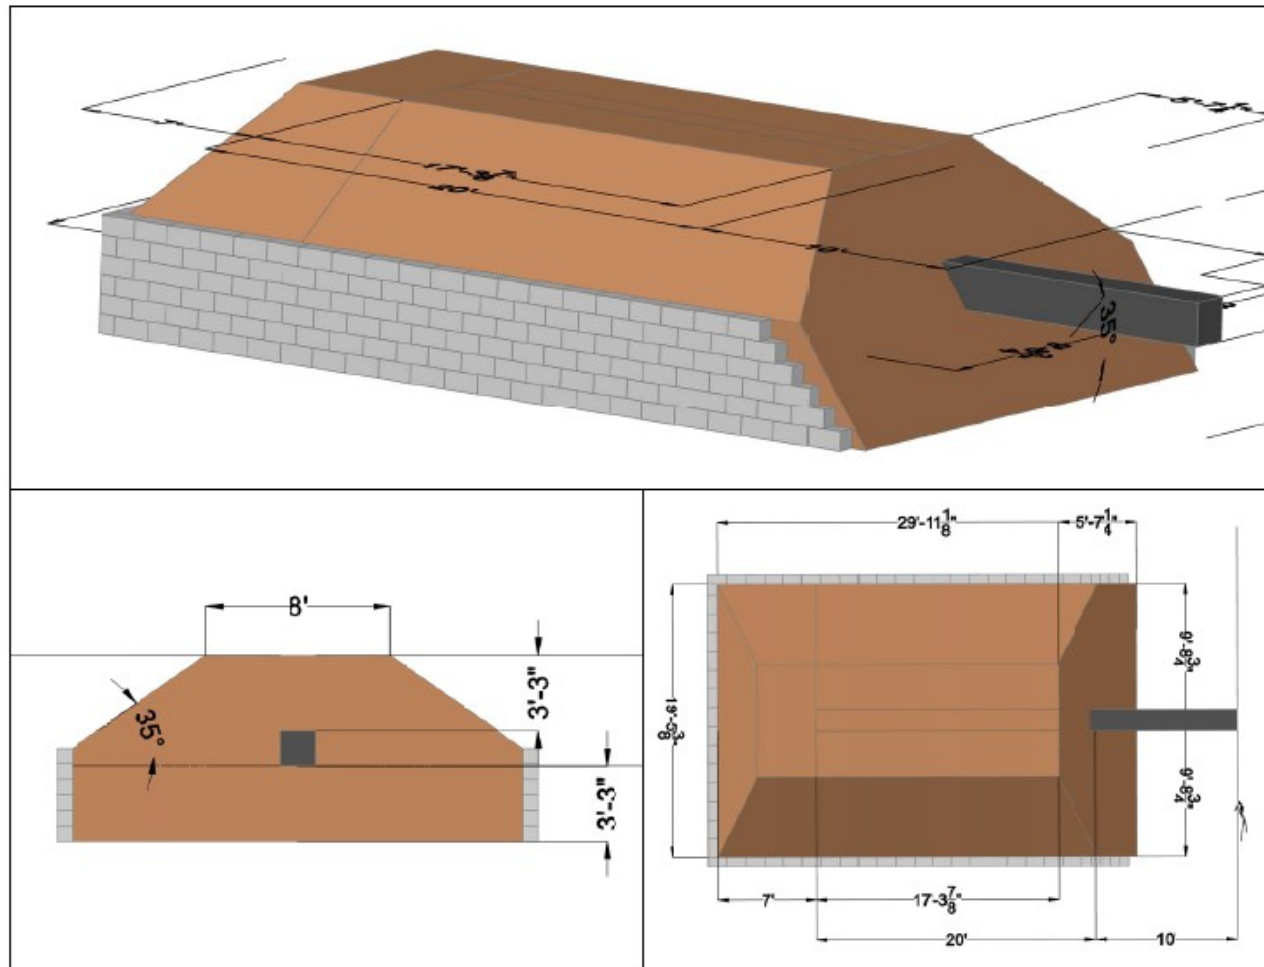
Layout of soil embankment and test pile for pile-soil dynamic testing.
